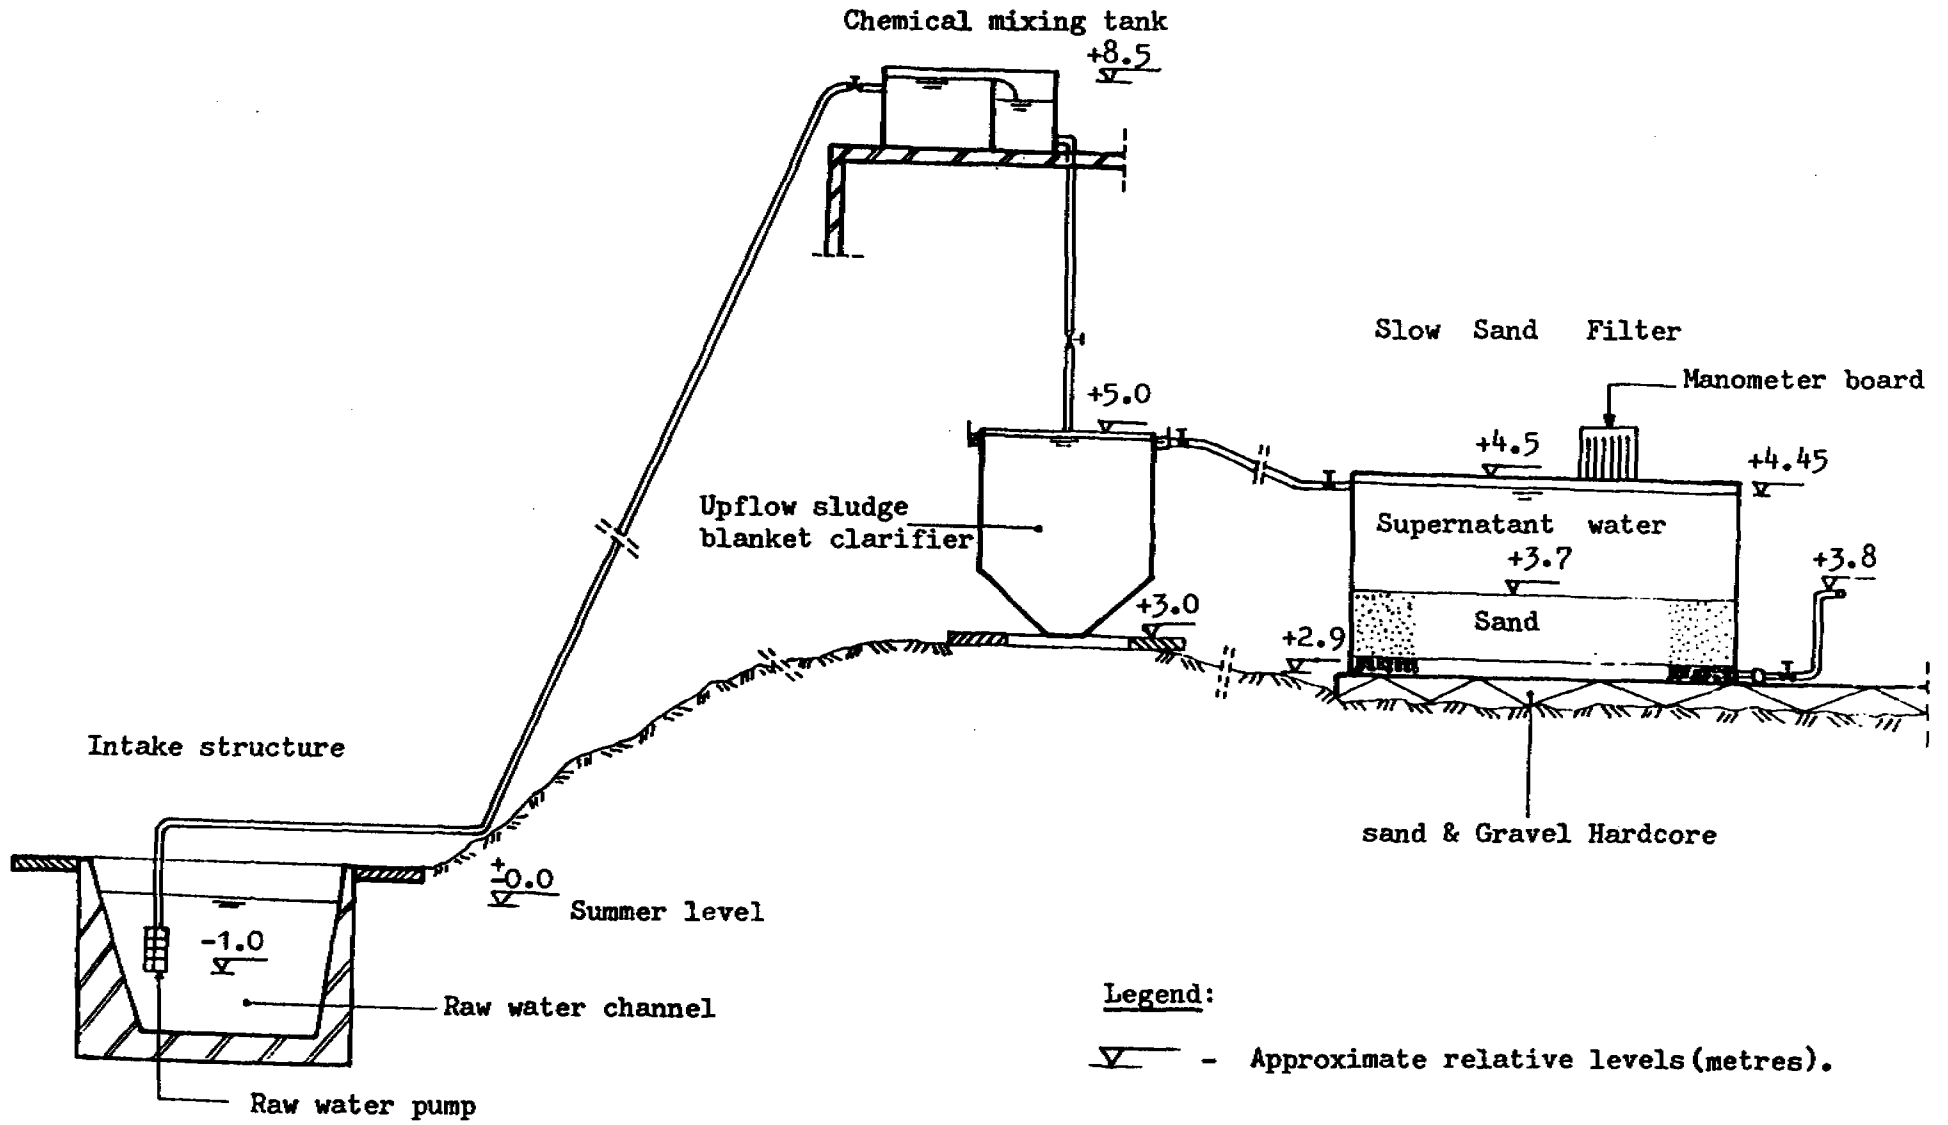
Schematic hydraulic profile of Egham pilot plant.
